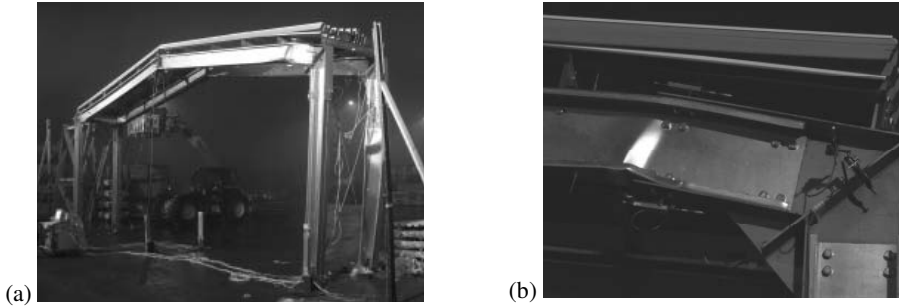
C2 frame: (a) global view and (b) local buckling of the right beam connection.
